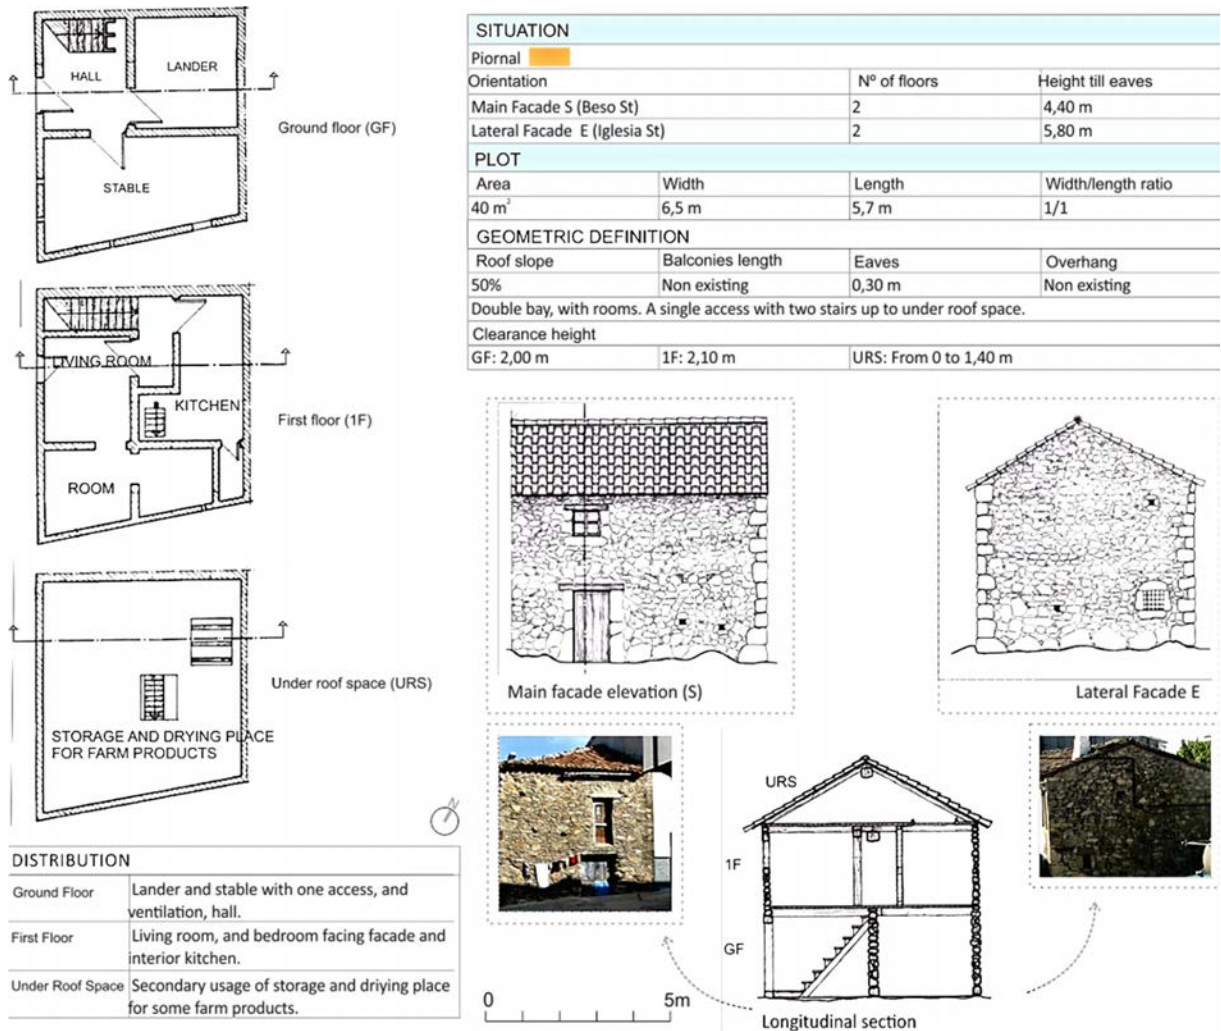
Example of an information sheet for an historic dwelling in El Valle (drawings from Valverde, [14].
